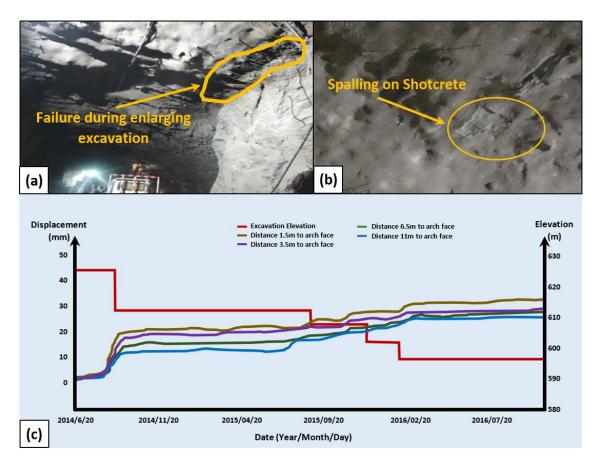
Technical problems in the construction stage, (a) occurring failure through enlargement excavation, (b) cracking and spalling on the shotcrete, (C) displacement monitoring in an underground excavation
